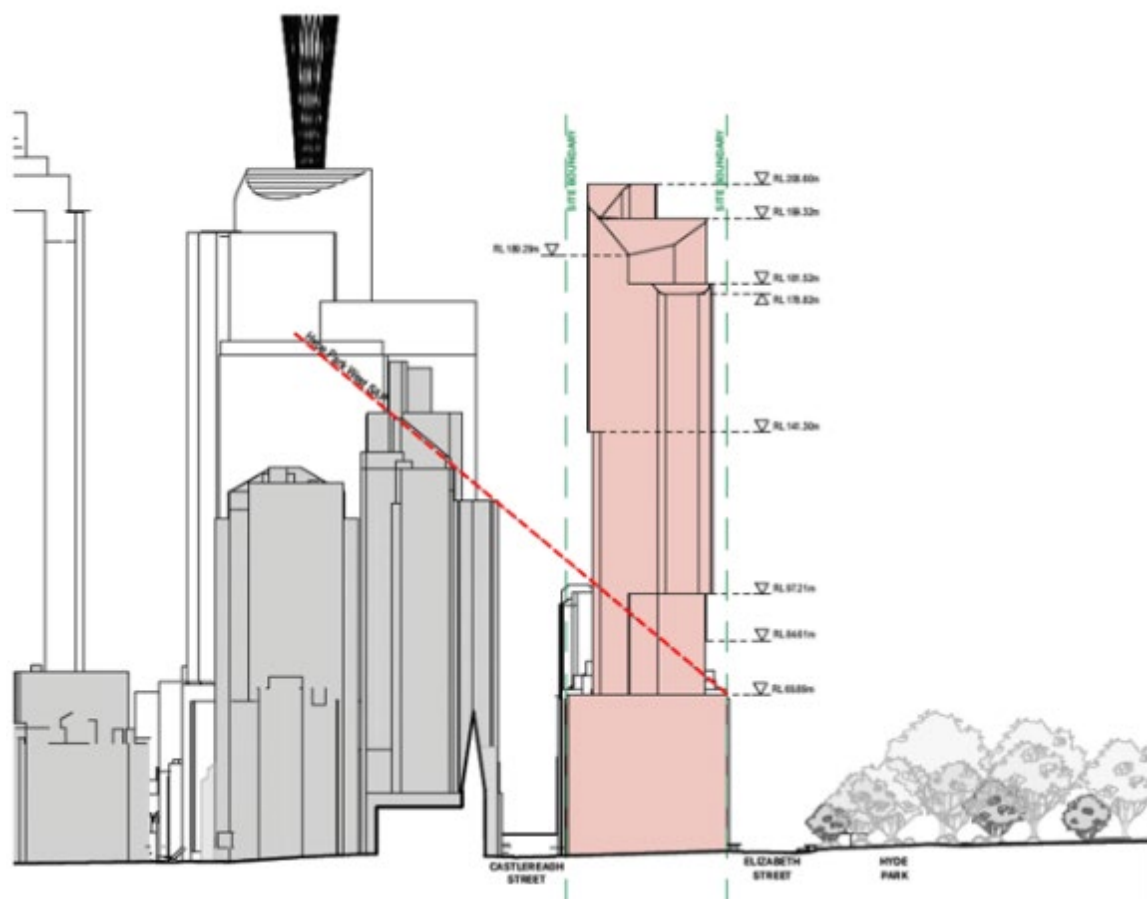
| Proposed south elevation depicting the location of the Hyde Park West sun access plane (in red) in relation to the development (Source: Ethos Urban building envelope design report)
